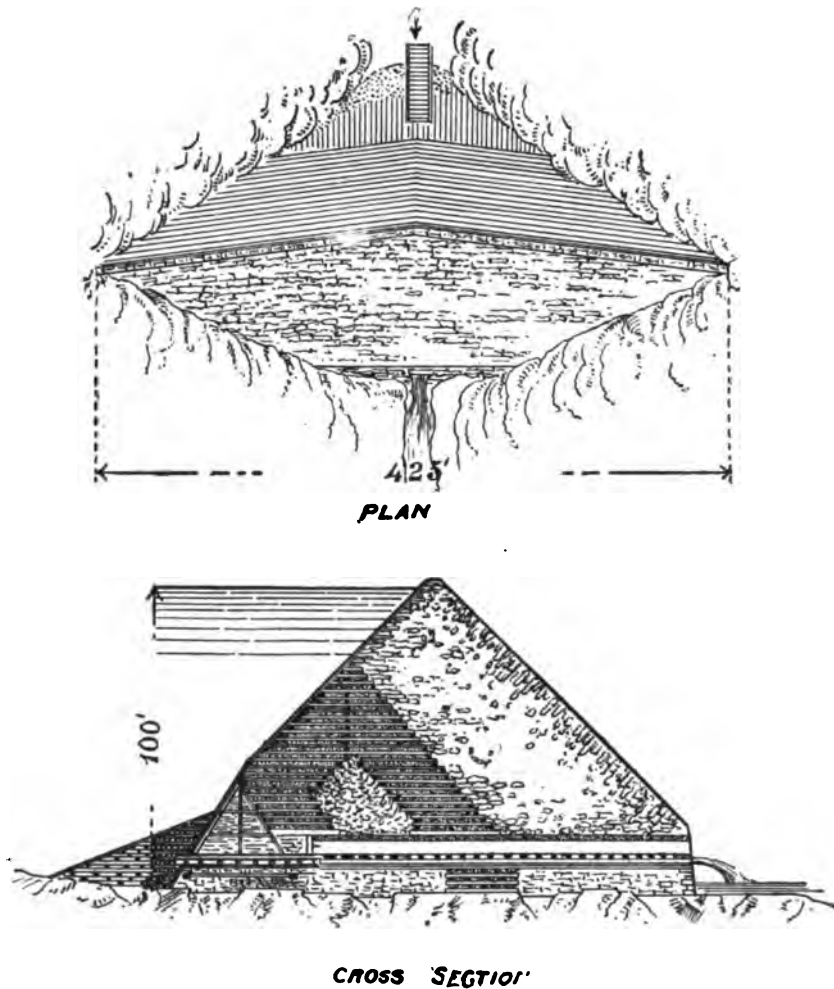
PLAN AND CROSS-SECTION OF THE BOWMAN DAM, AN EARLY TYPE OF THE CALIFORNIA ROCK-FILL DAM FOR HYDRAULIC MINING STORAGE.
